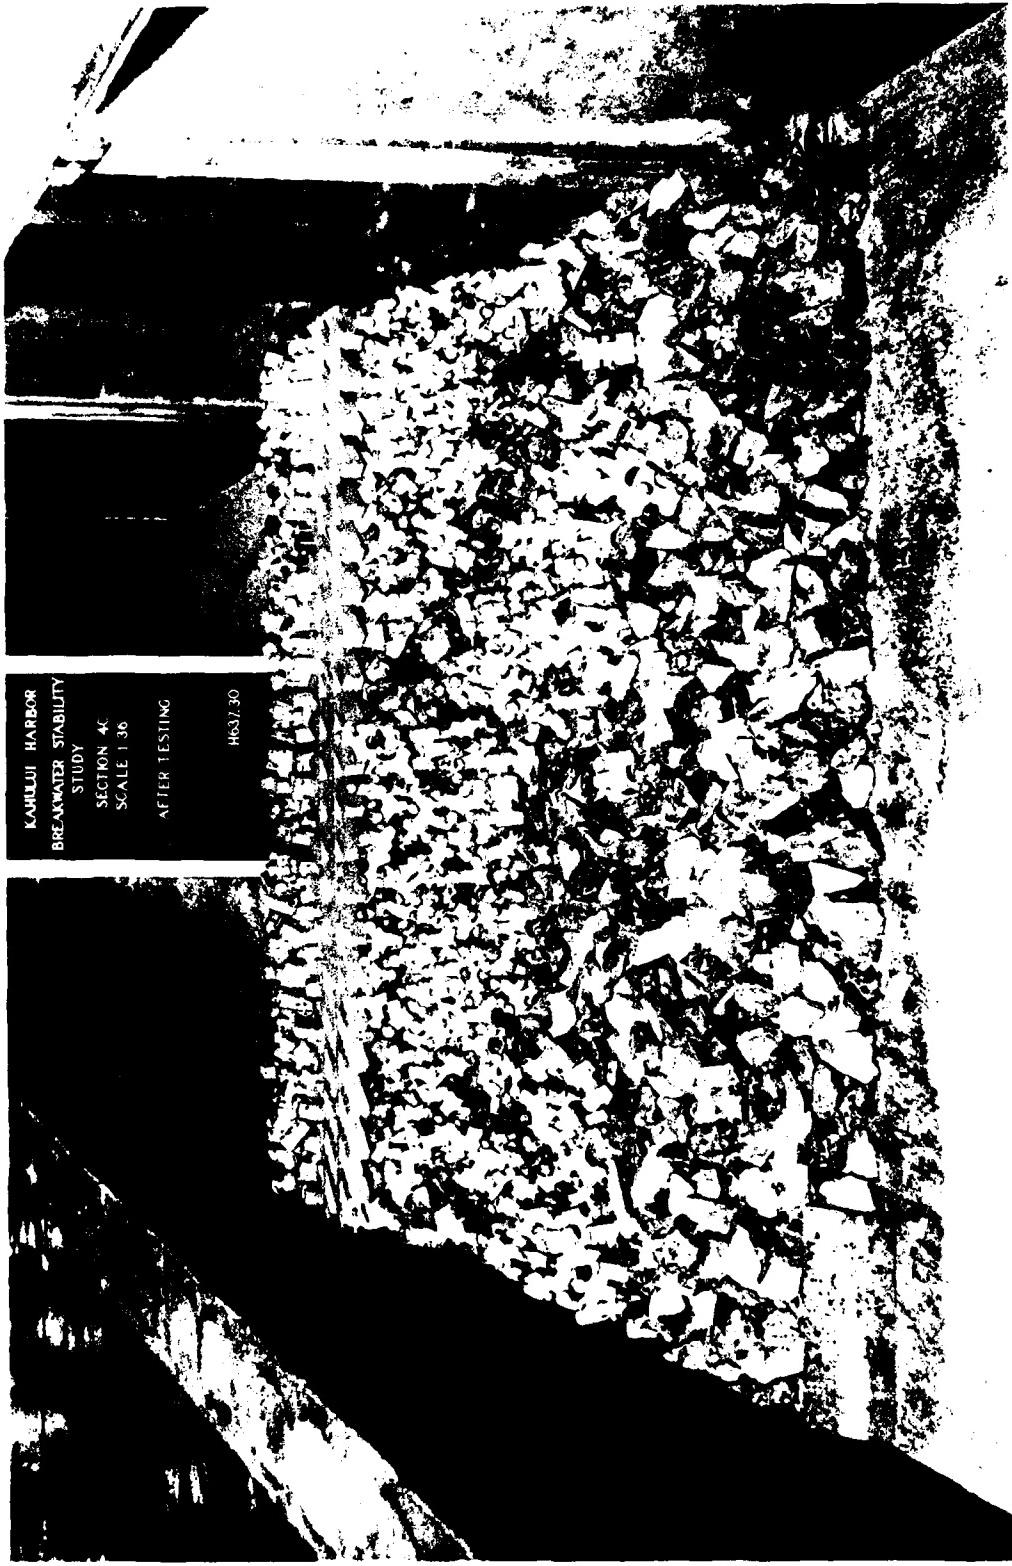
Harbor-side view of Plan 1F after testing, 2nd test
